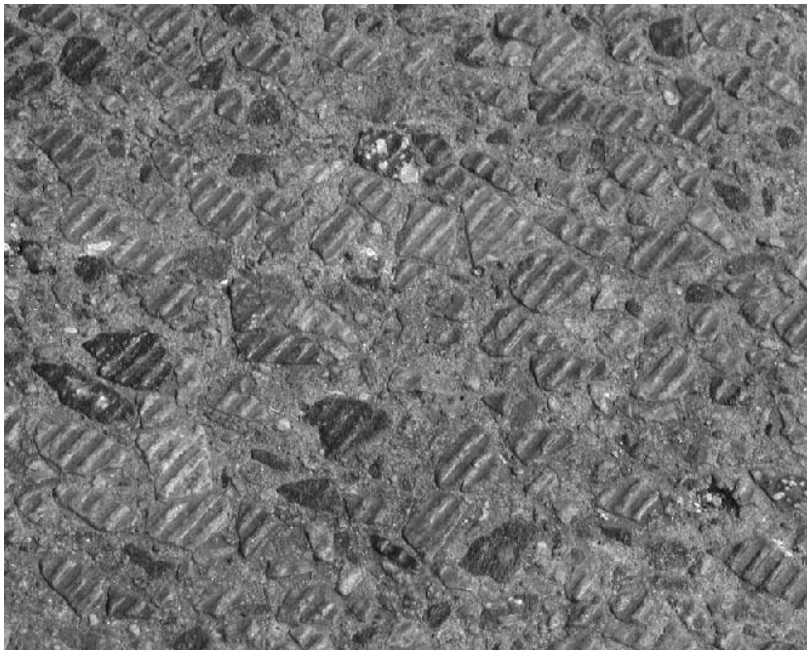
Scaling of concrete samples from Slagslunde Road. Tested shortly after construction in 1990
